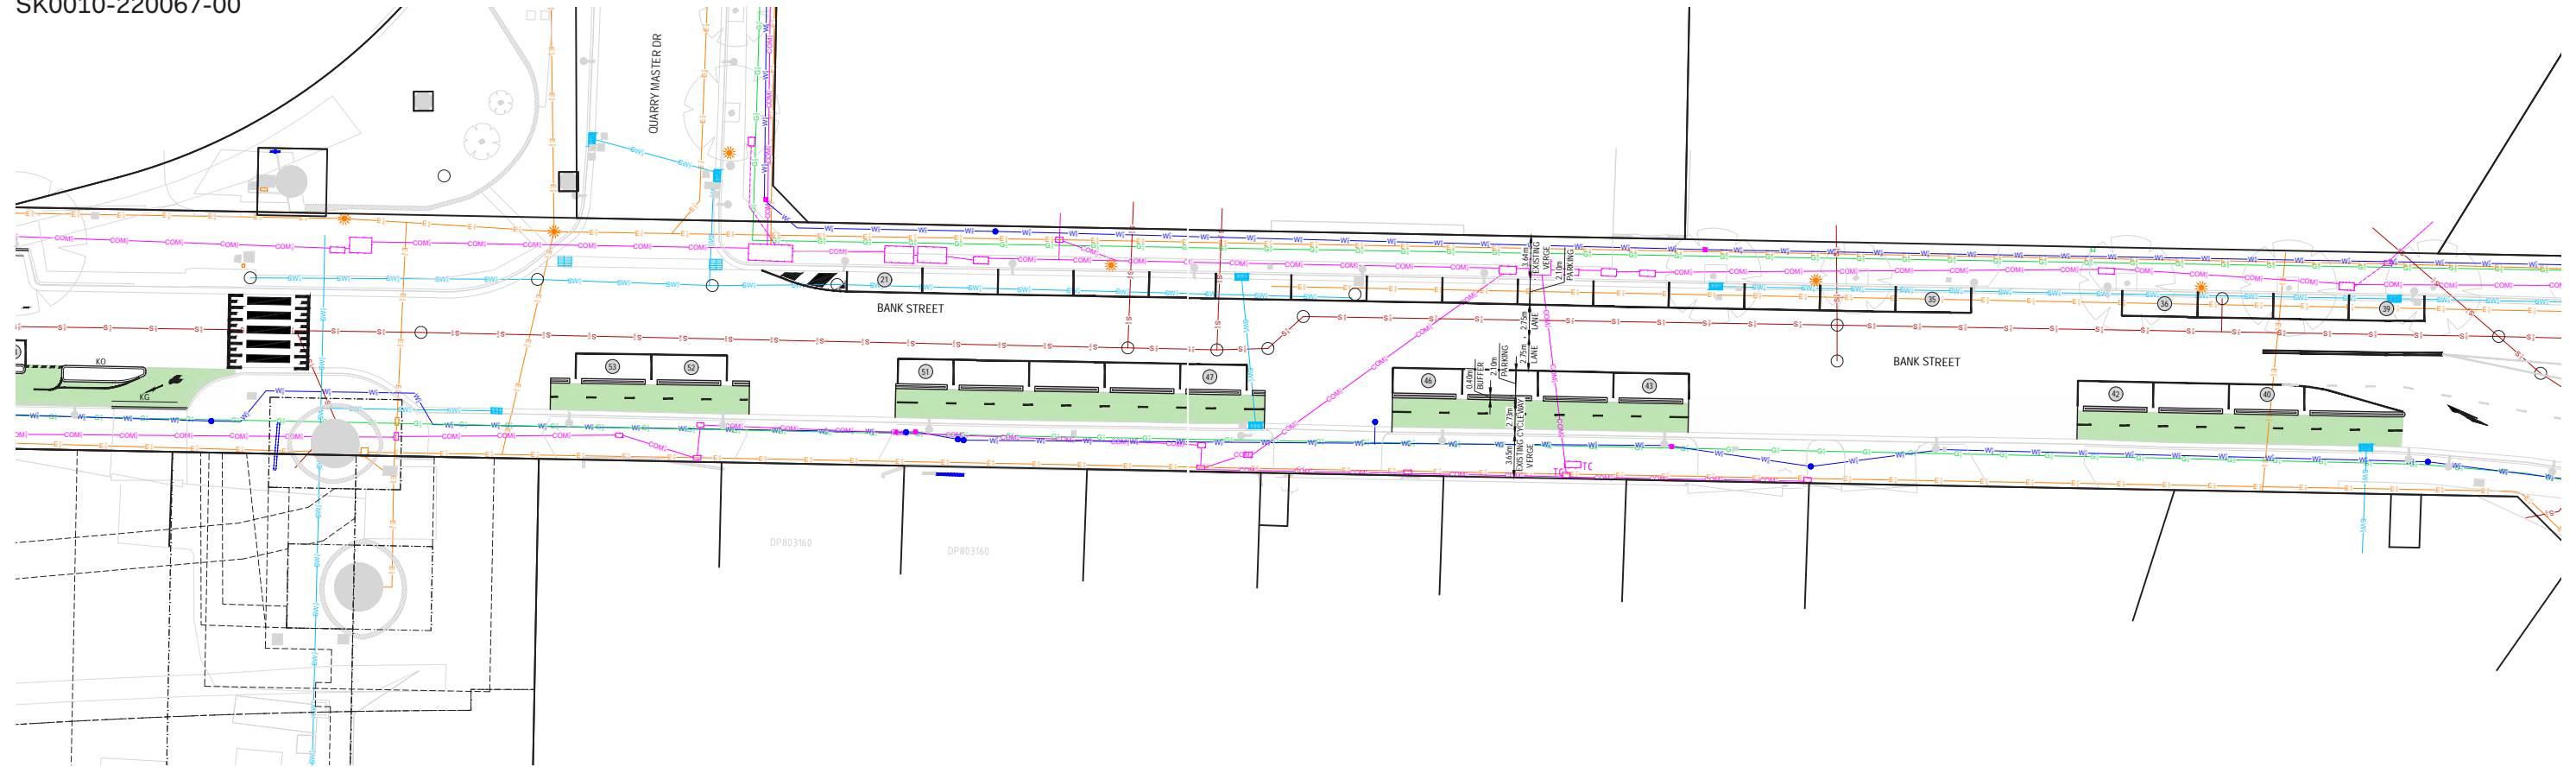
Bank Street Cycleway southern continuation (outside of scope)
